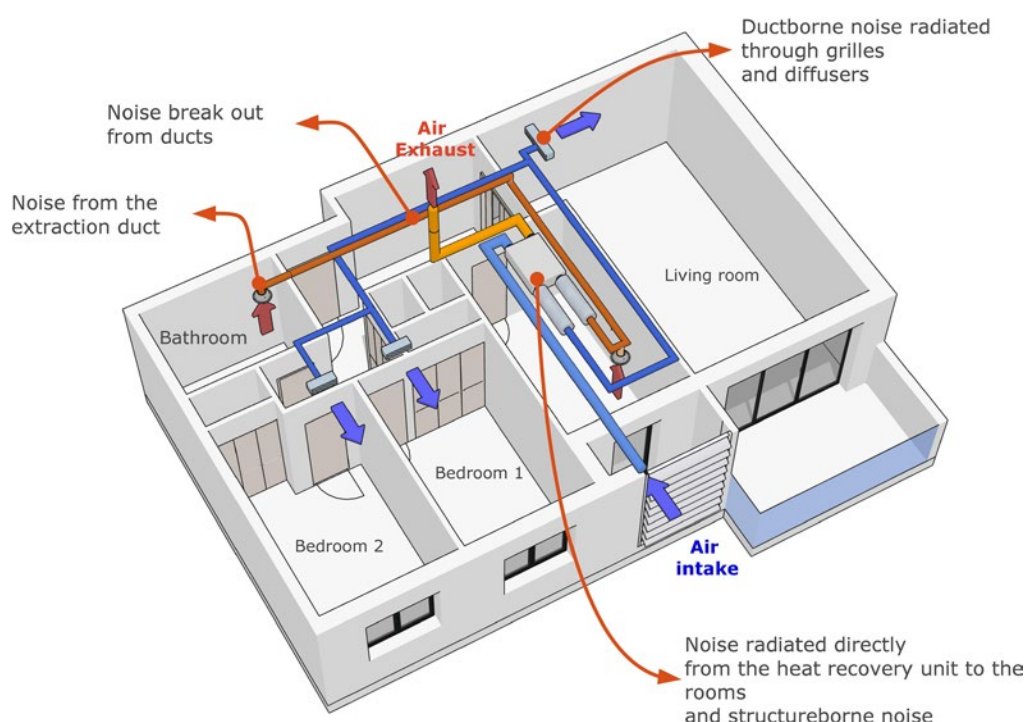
Typical layout of a MVHR system in a dwelling and its potential noise sources.
